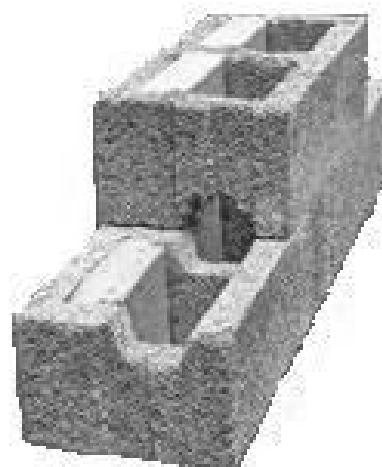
Faswall® wall forms. (Photo courtesy of ShelterWorks Ltd.)
